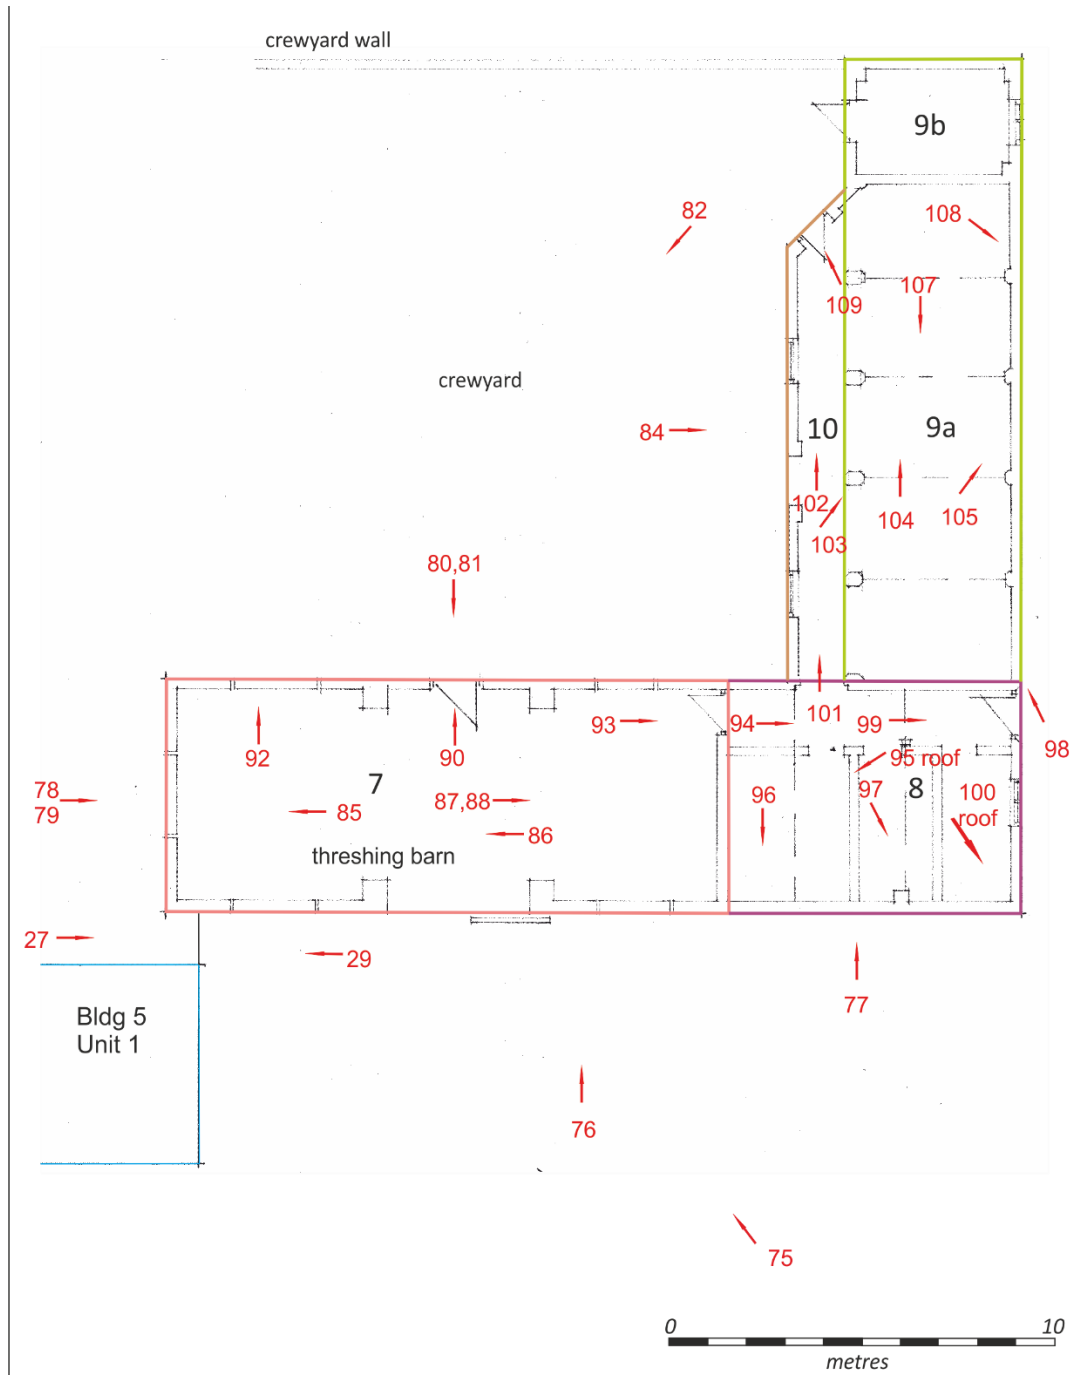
Unit 2 Ground floor plan as existing. Buildings 7-10 constructed in sequence. Numbered arrows show direction of photographs. See Appendix 1
